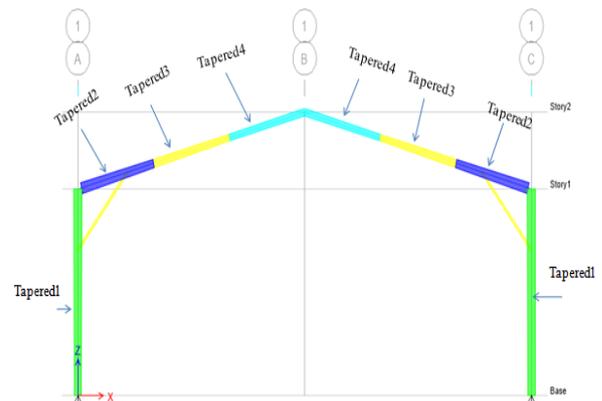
Cross sectional view showing various Tapered Sections assigned for PEB
